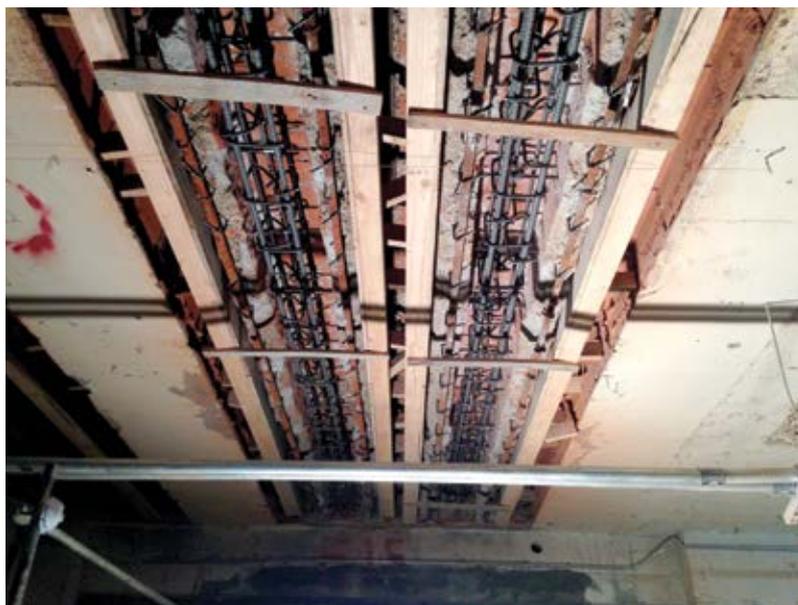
This is a prepped area prior to shooting; sound existing reinforcing bar was left in place and reinforced with new reinforcing bar and dowels. The edge form was set to bind the sides of the joist infill
